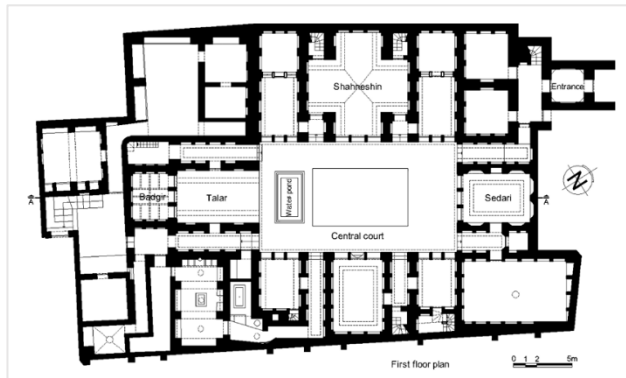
First floor plan, Tehraniha house, Yazd (Hajighassemi, 2005)
